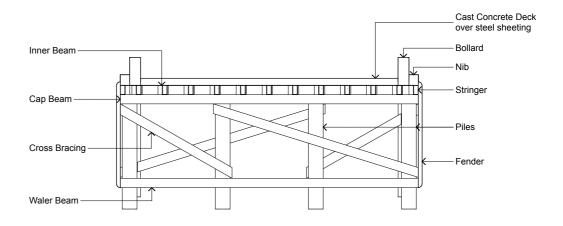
Typical bent from the head portion of the wharf as originally built with key structural elements labelled.
